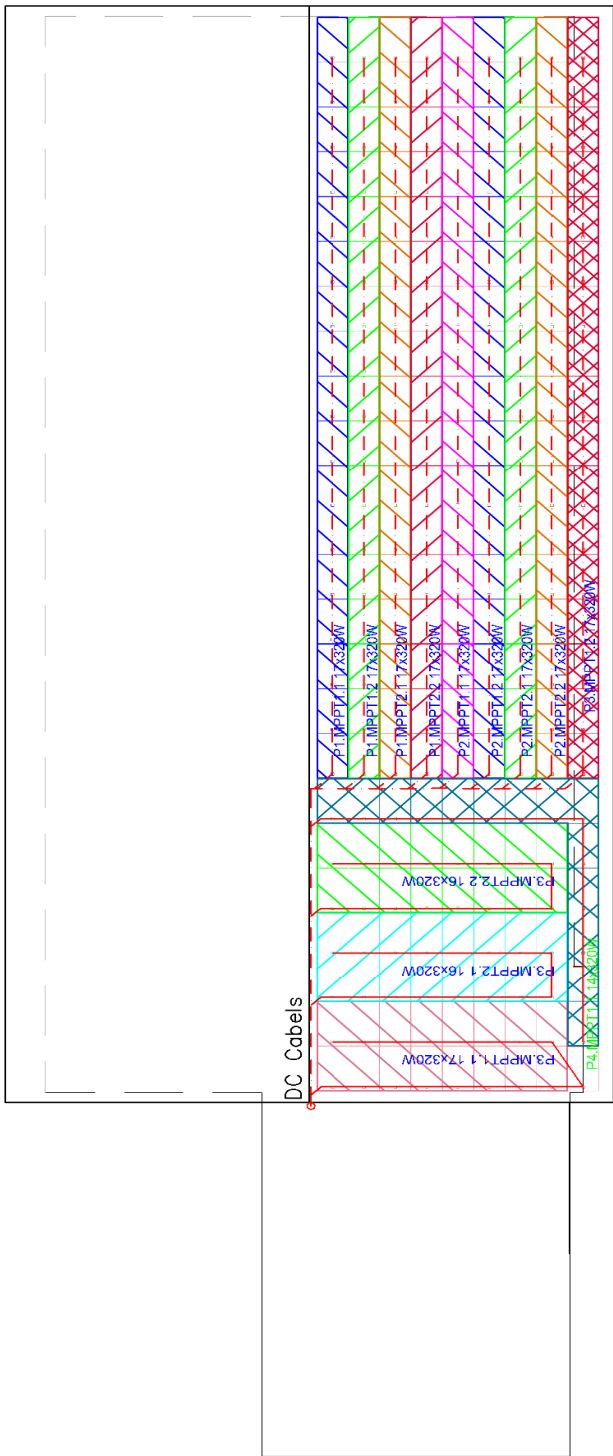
PV arrays of Photovoltaic power plant on UNISB building in I. Gundulić Street (ground plan)
